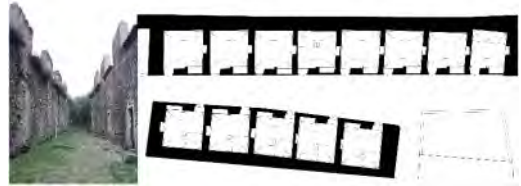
Barracks in Castelo de Vide – view and ground floor plan. Source: Rosado et al. 2019.
